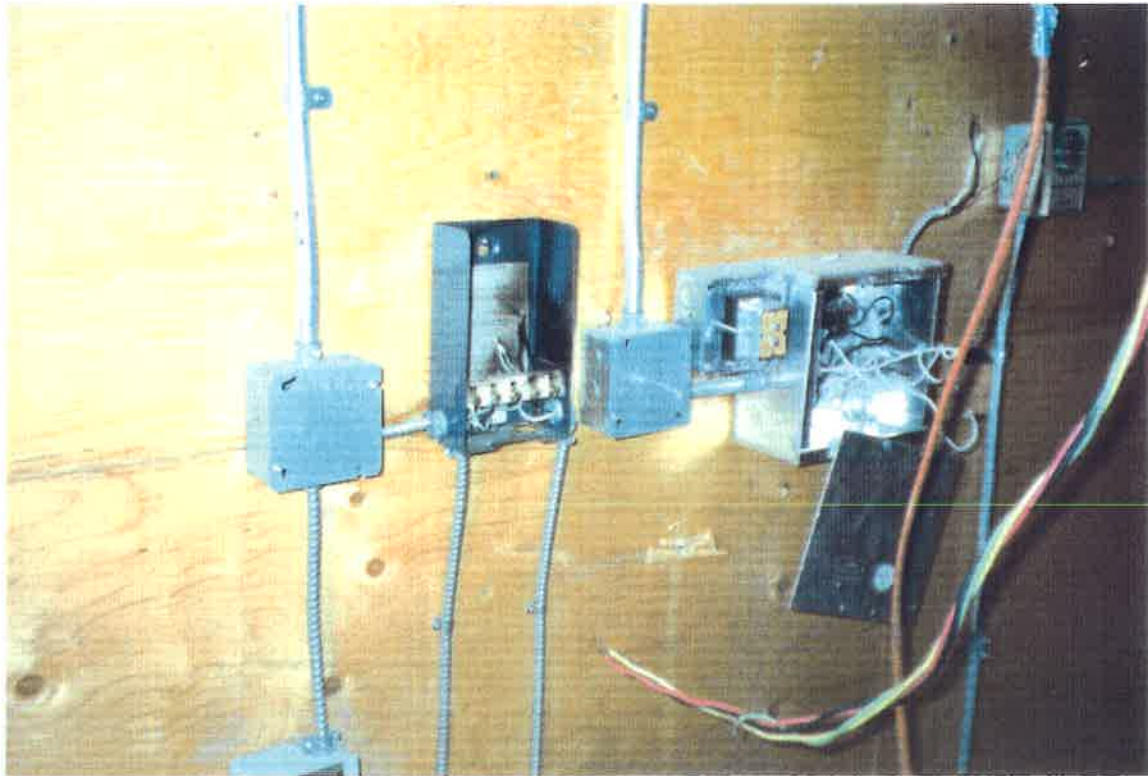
Photo M: Burwash Landing - Damaged Electrical Control Panel at Well
